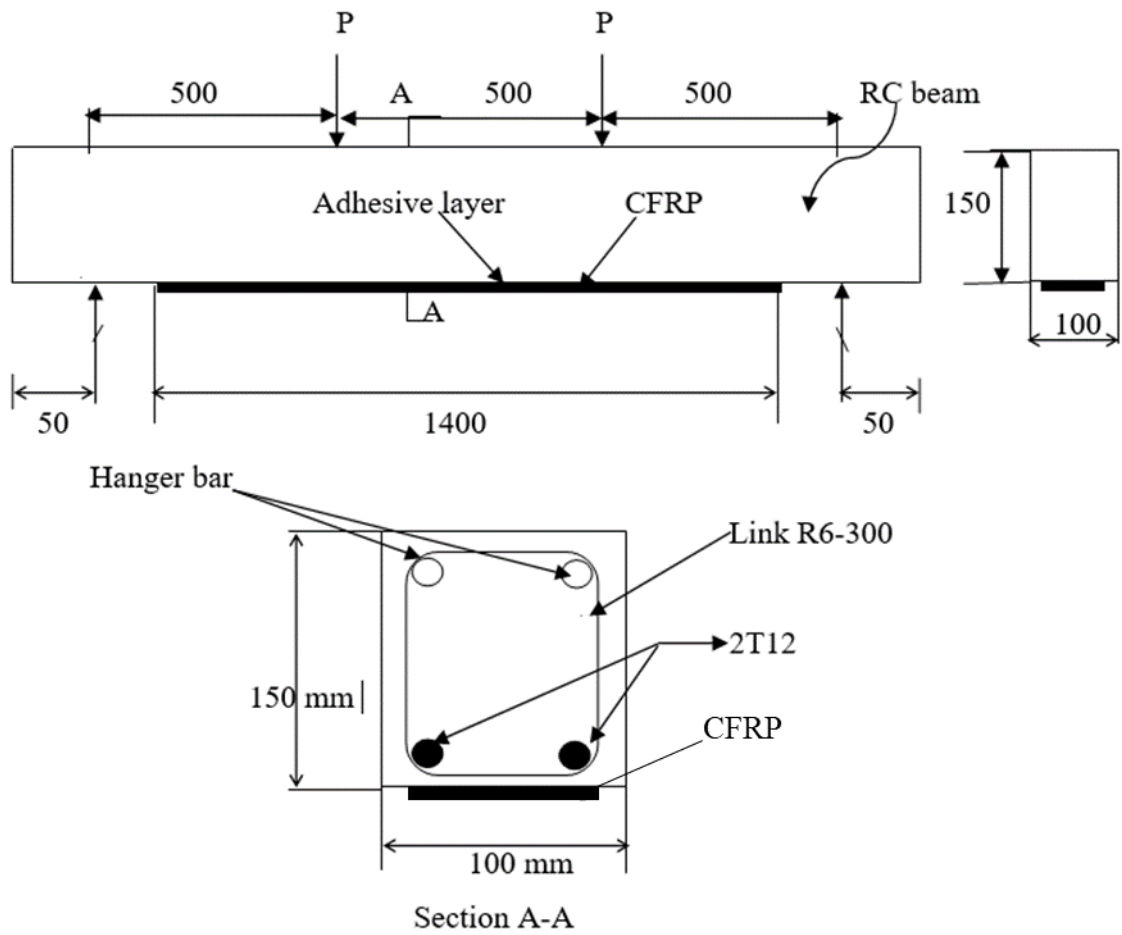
RC beam bonded with CFRP configuration and load arrangement
